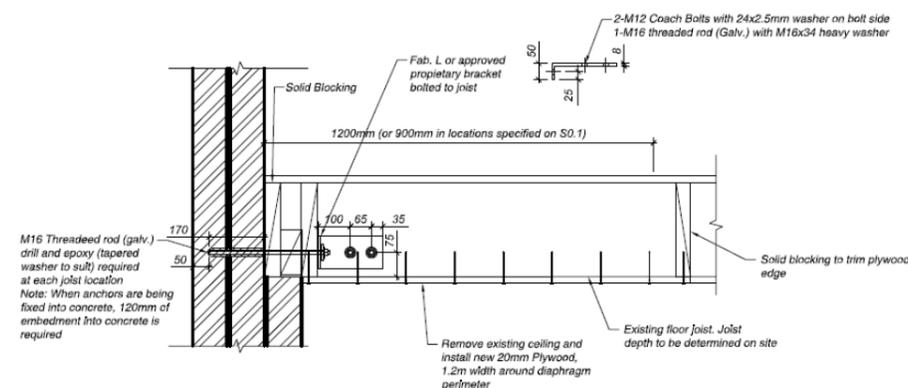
Diaphragm to Wall typical remedial detail - Joist Perpendicular
